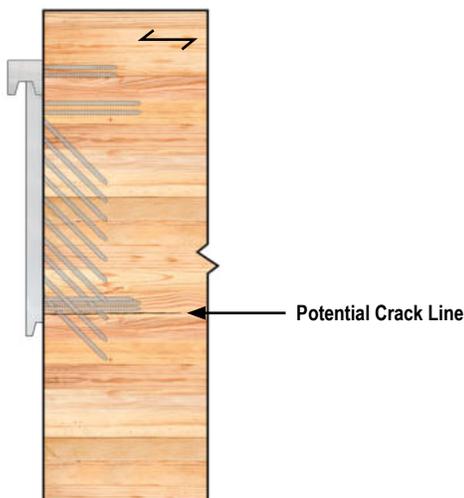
Lowest Inclined Fastener in Beam Hanger Does Not Support Bottom of Member
